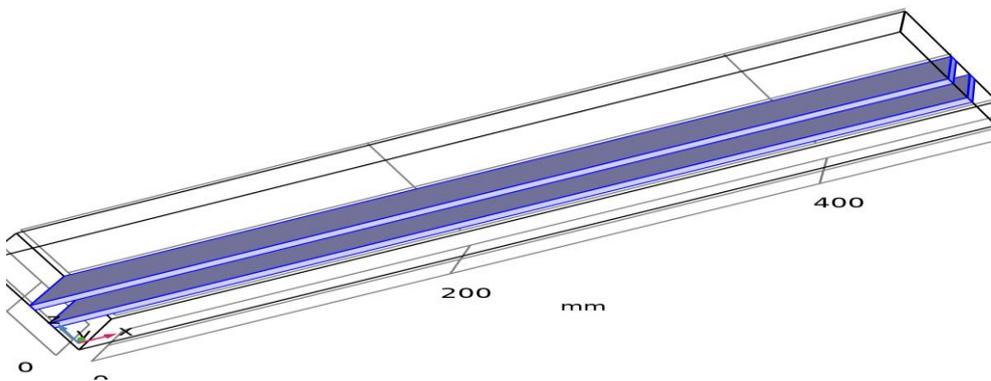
Reinforcement model of rubberized concrete containing 10% of replaced rubber
